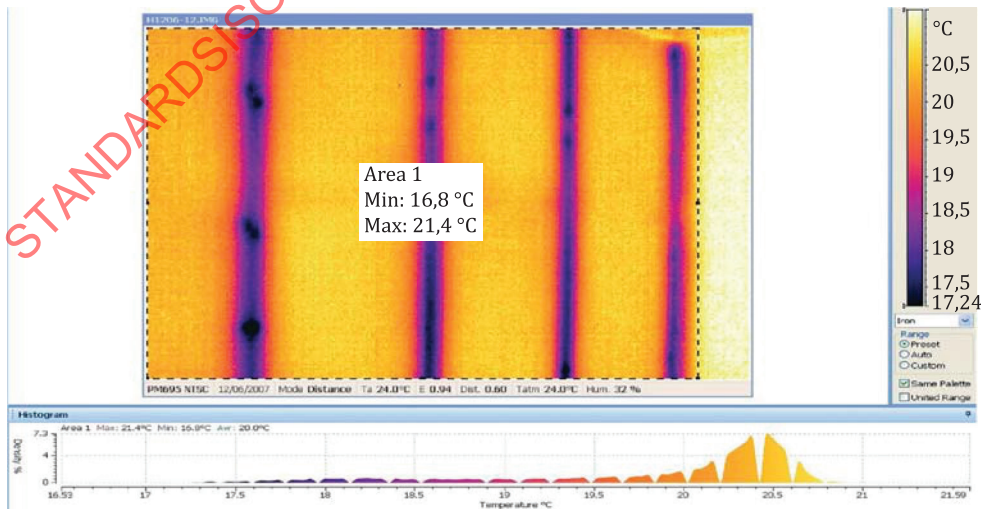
Wall — Insulated stud wall with good construction — Qualitative illustration of heat loss with histogram
